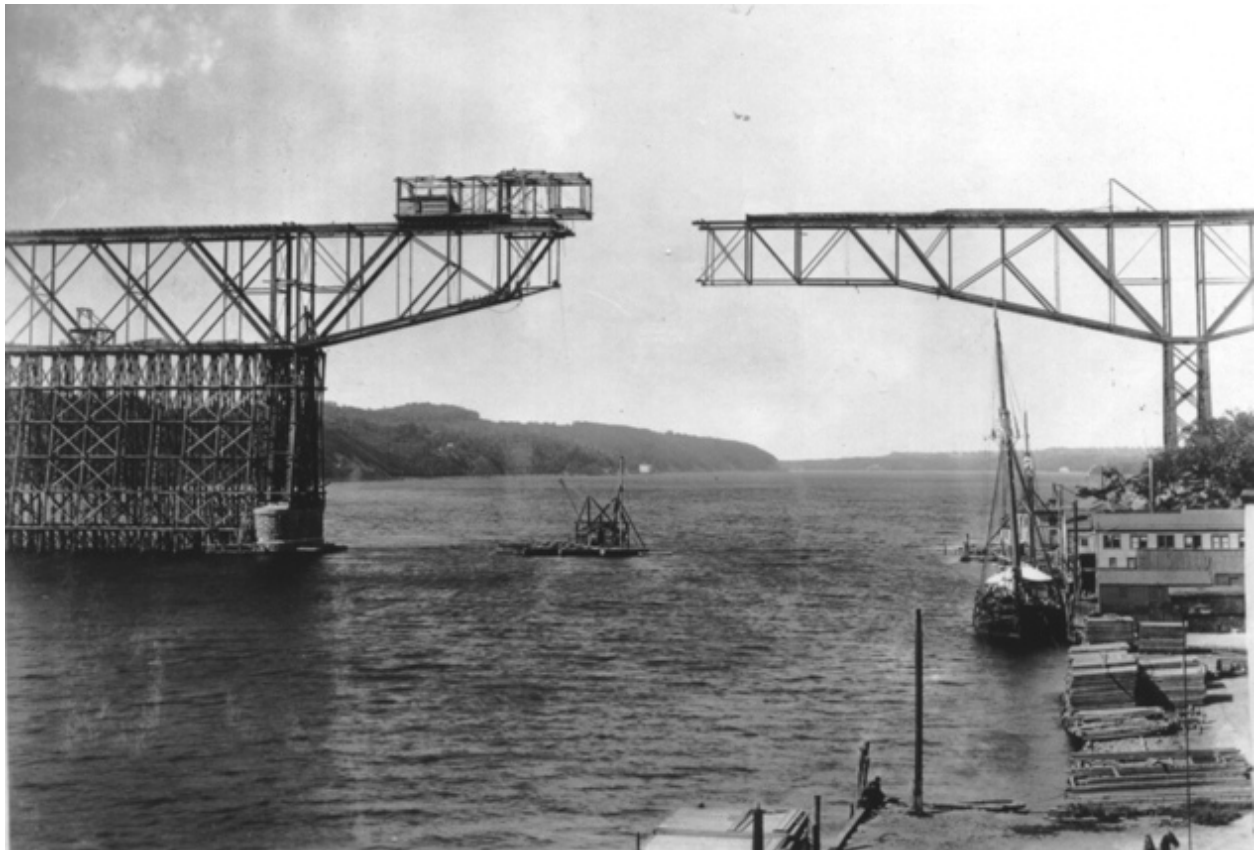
A cantilevered section being constructed. Note the wood framing supports for the truss section in the left of the image. Image accessed from Walkway Over the Hudson, <http://walkway.org/visit/visitor-photos/>
